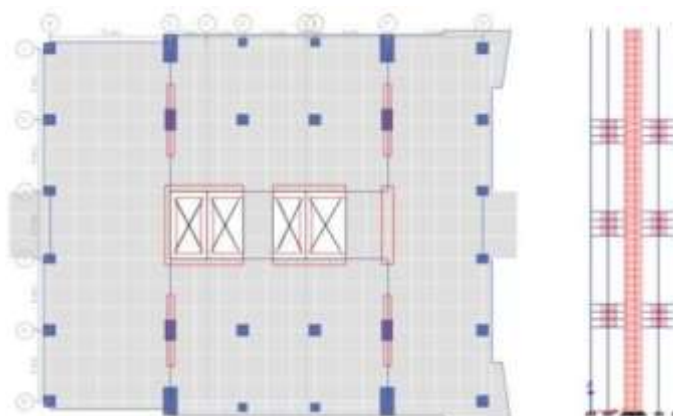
Typical floor plan of flag wall system (S. A. Reddy and N. Anwar, 2018)
